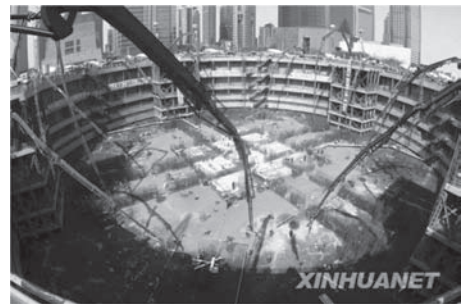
A photo showing pouring concrete of the bottom slab of the tower block of the Shanghai tower (from <http://news.xinhuanet.com/photo>).
